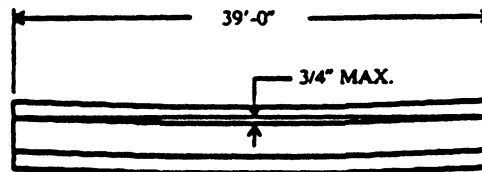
Top View of Uniform Lateral Sidesweep Tolerance per Section 13.6.
